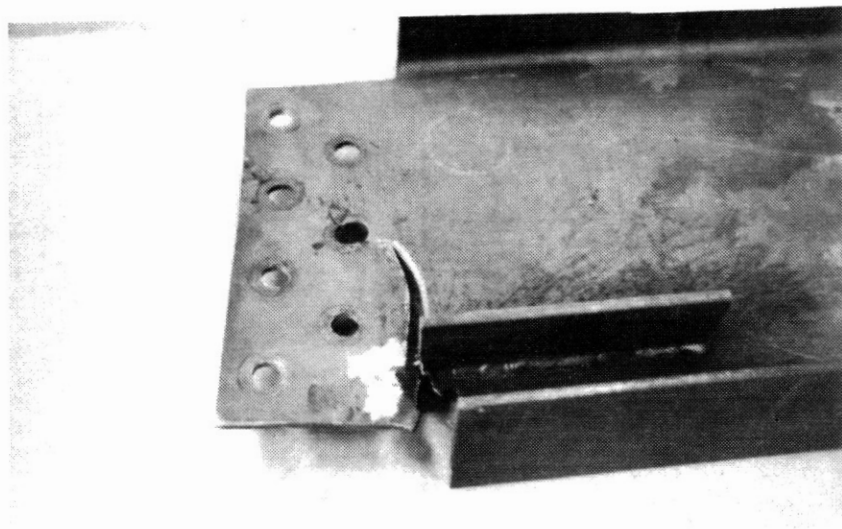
Failure of the Auxiliary Flange Detail
